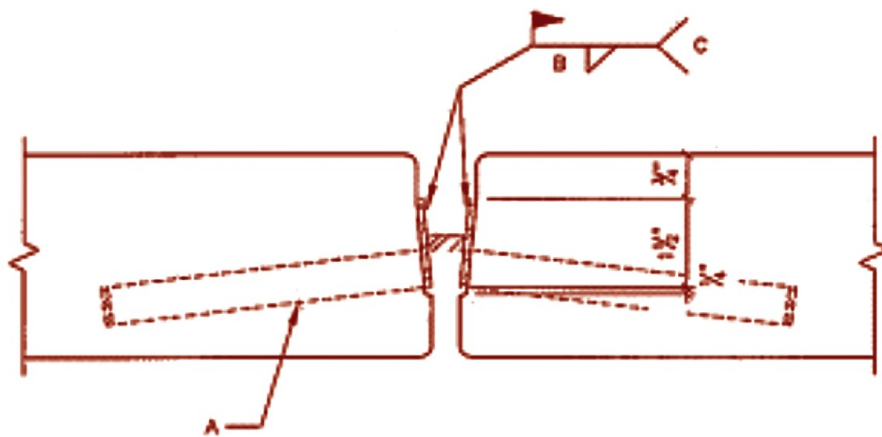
Excerpt of a connection detail from the precaster's engineer.
